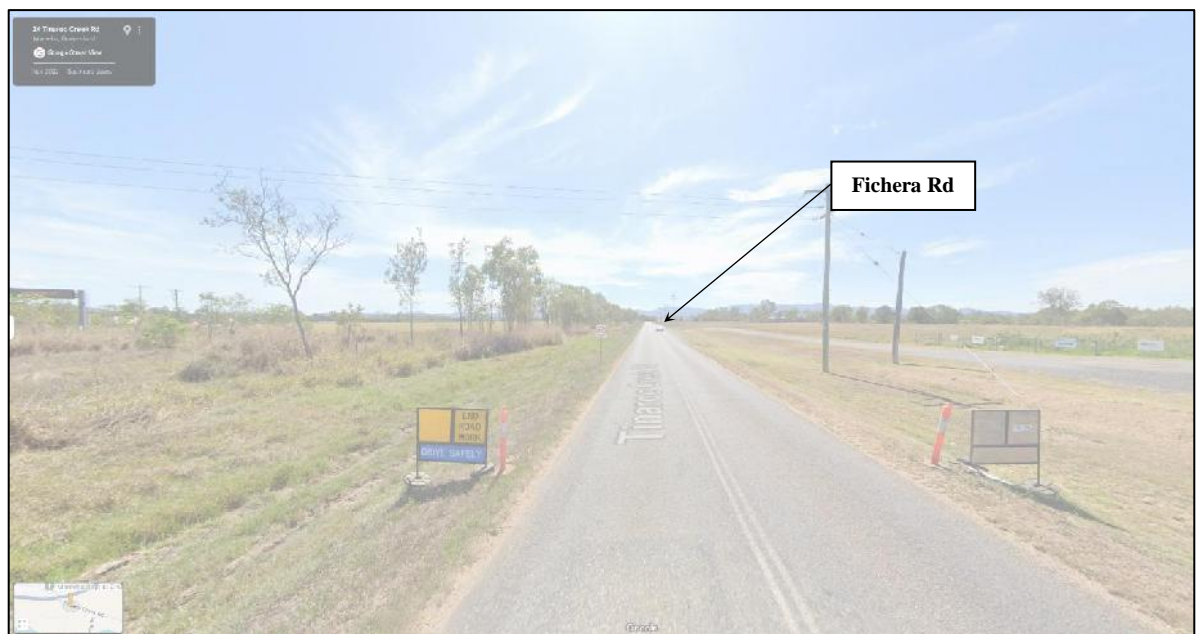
Looking East towards Fichera Road at Tinaroo Creek Road (Source: Google Map Street View – Nov 2022)
